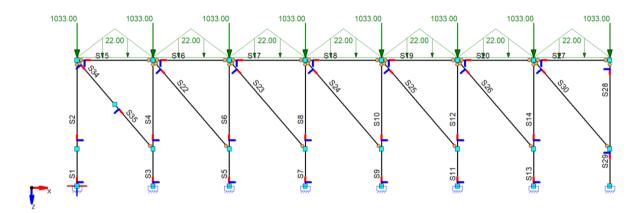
L4: Variable load from the building and the deck plates. Units in kN and kN/m
